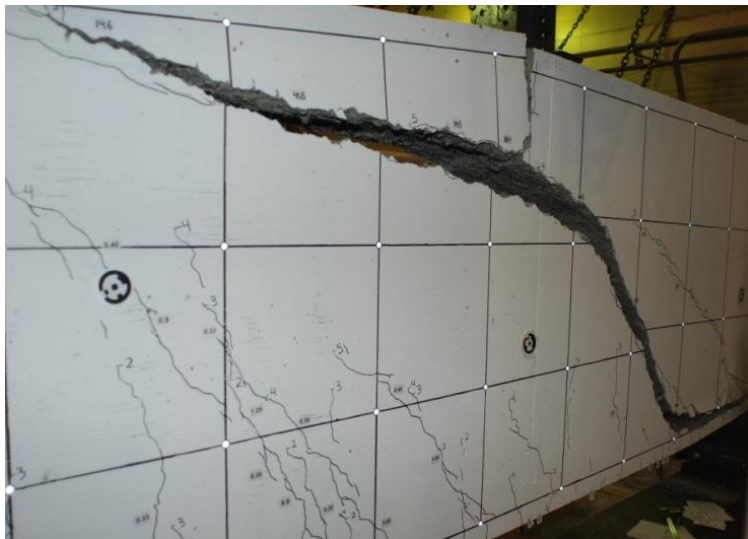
Overall Failure Crack on South Face of S1000-A3
